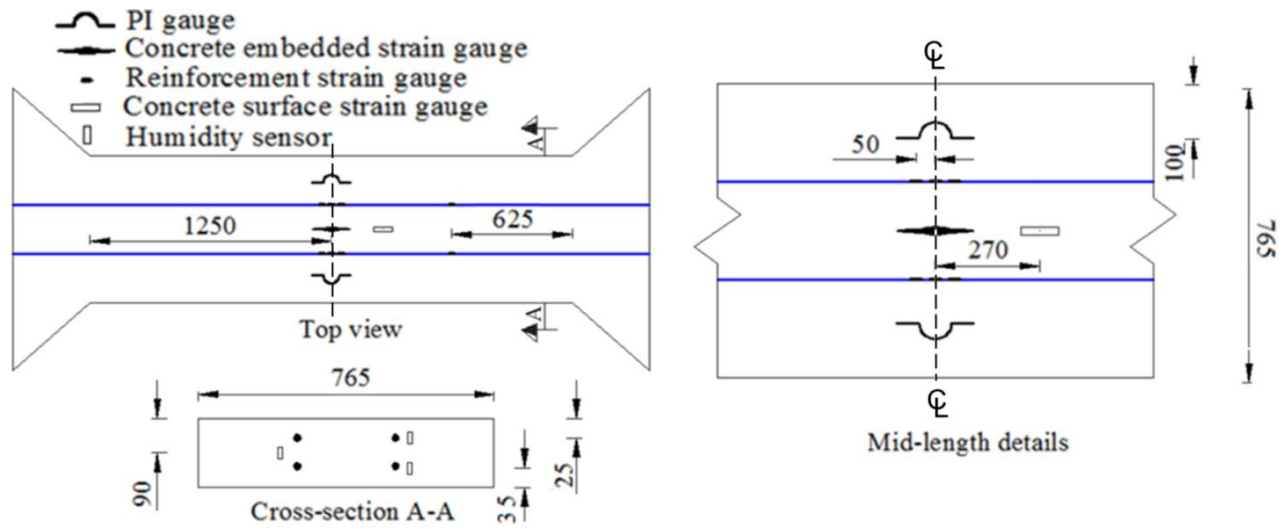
Typical instrumentation of deck slabs (all dimensions are in mm).
